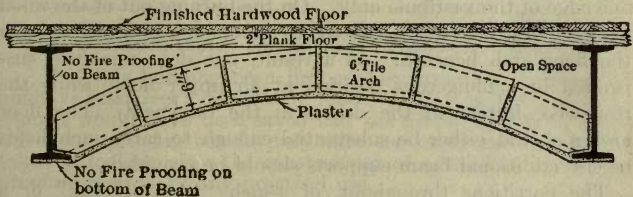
Floor Construction, Equitable Building, Baltimore Fire.
